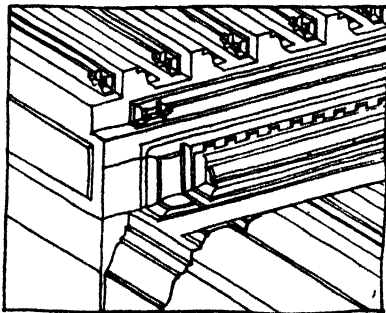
CEILING AT THE HOTEL DE VILLE, BEAUGENCY
